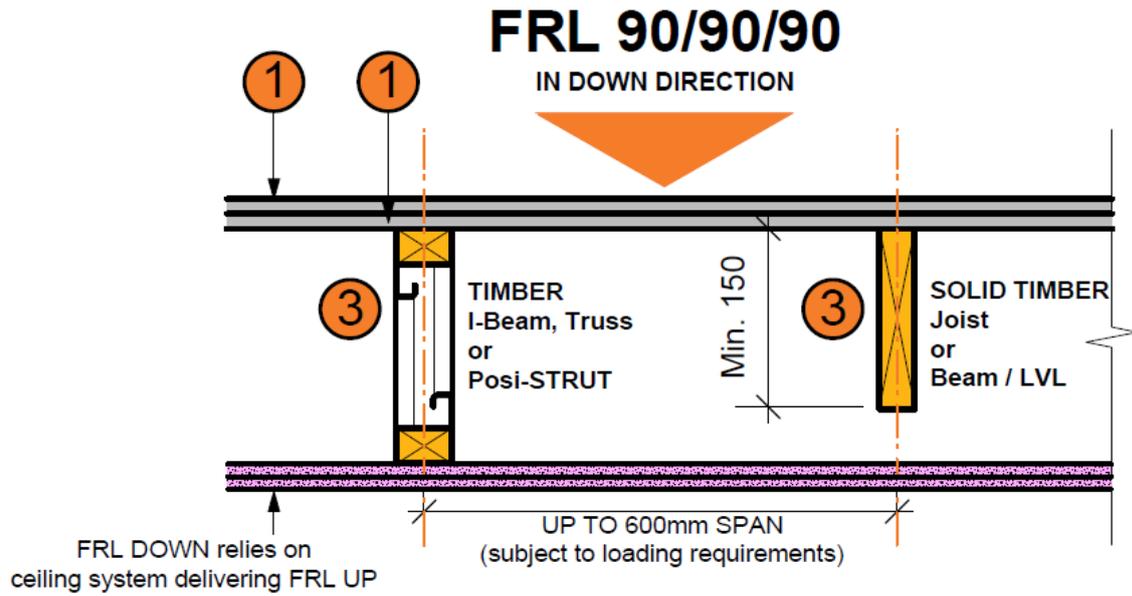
Timber frame floor/ceiling system with 2 × 19 mm INEX>FLOOR19
